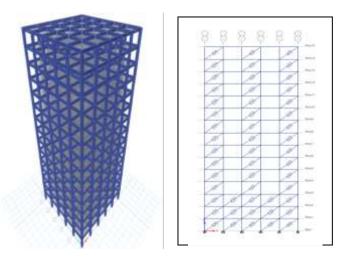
3-D view of Building.Fig-2: with damper of Building
